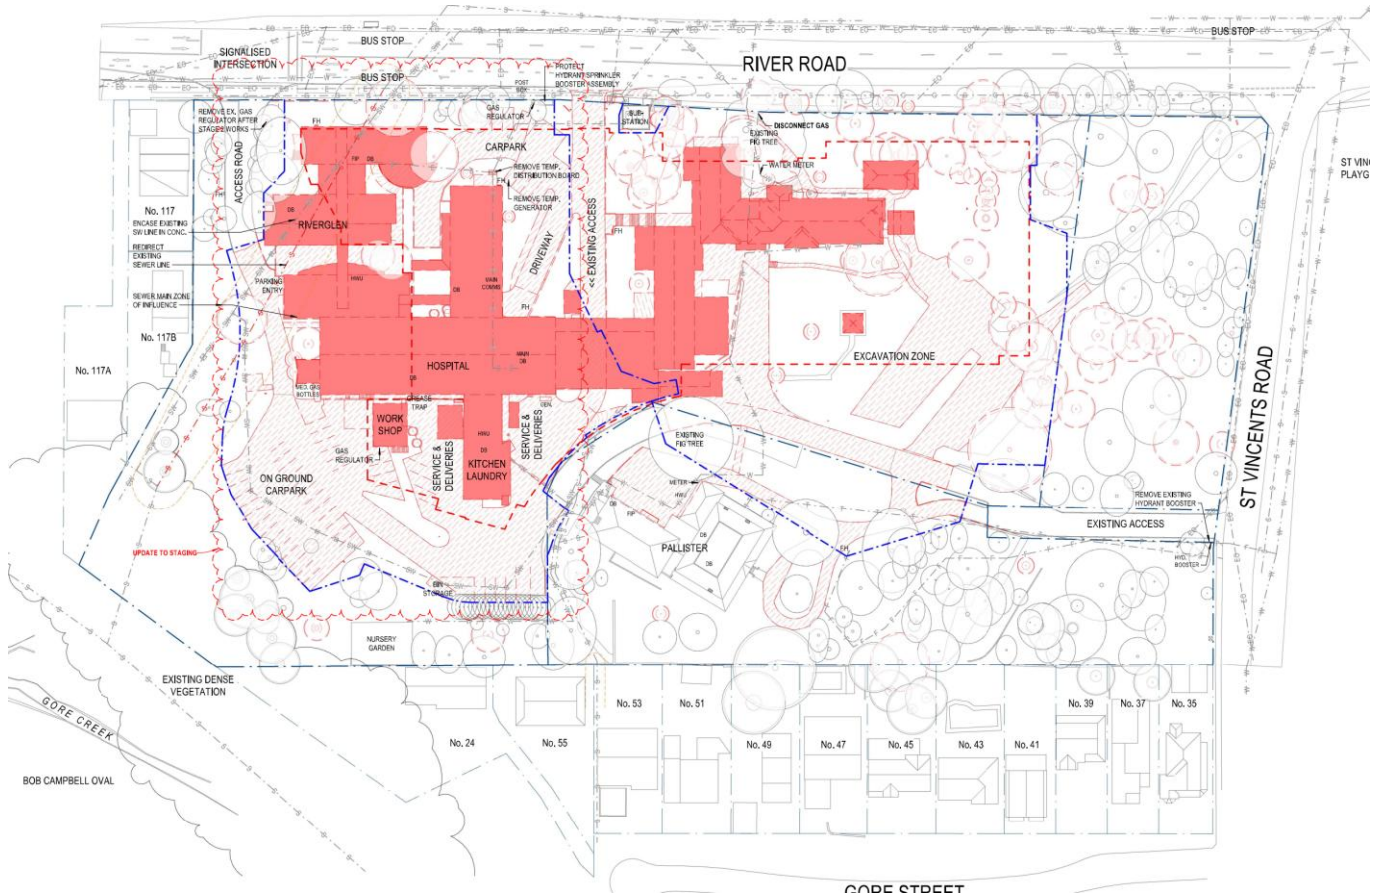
Amended concurrent site demolition plan – Stages 2 and 3
